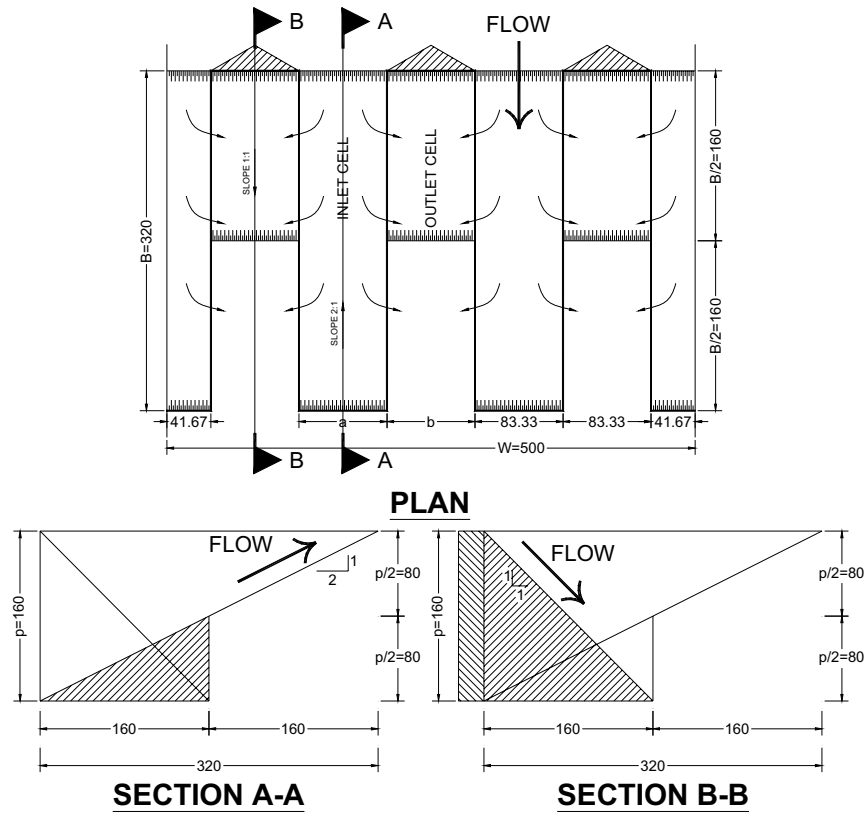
Plan and section of model P_4M_3 with inlet modification (dimensions in mm)
